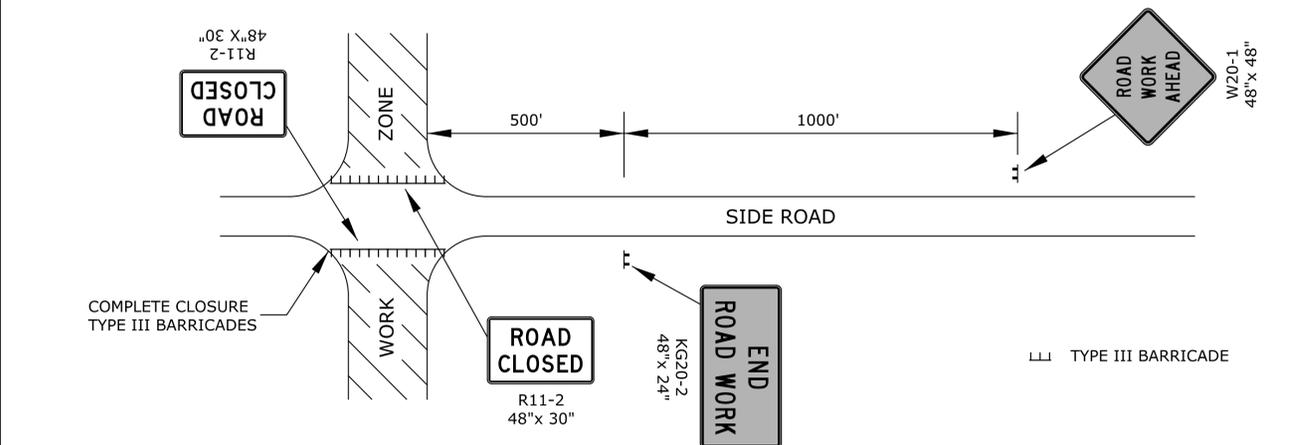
TYPICAL SIGNING FOR SIDE ROAD OPEN
